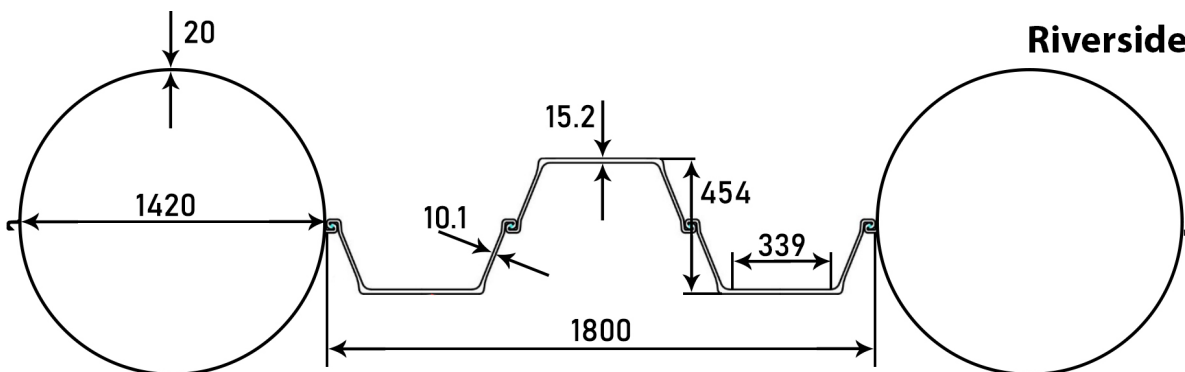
Combi wall of tubular piles with PU28 sheet piling.
